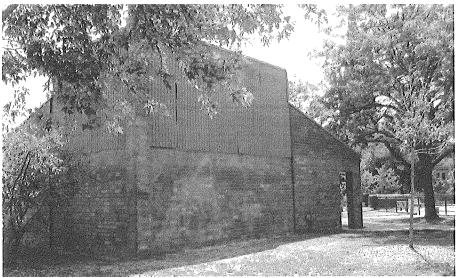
Street-side (west) facade of existing toilet/pump house building scheduled for demolition.
